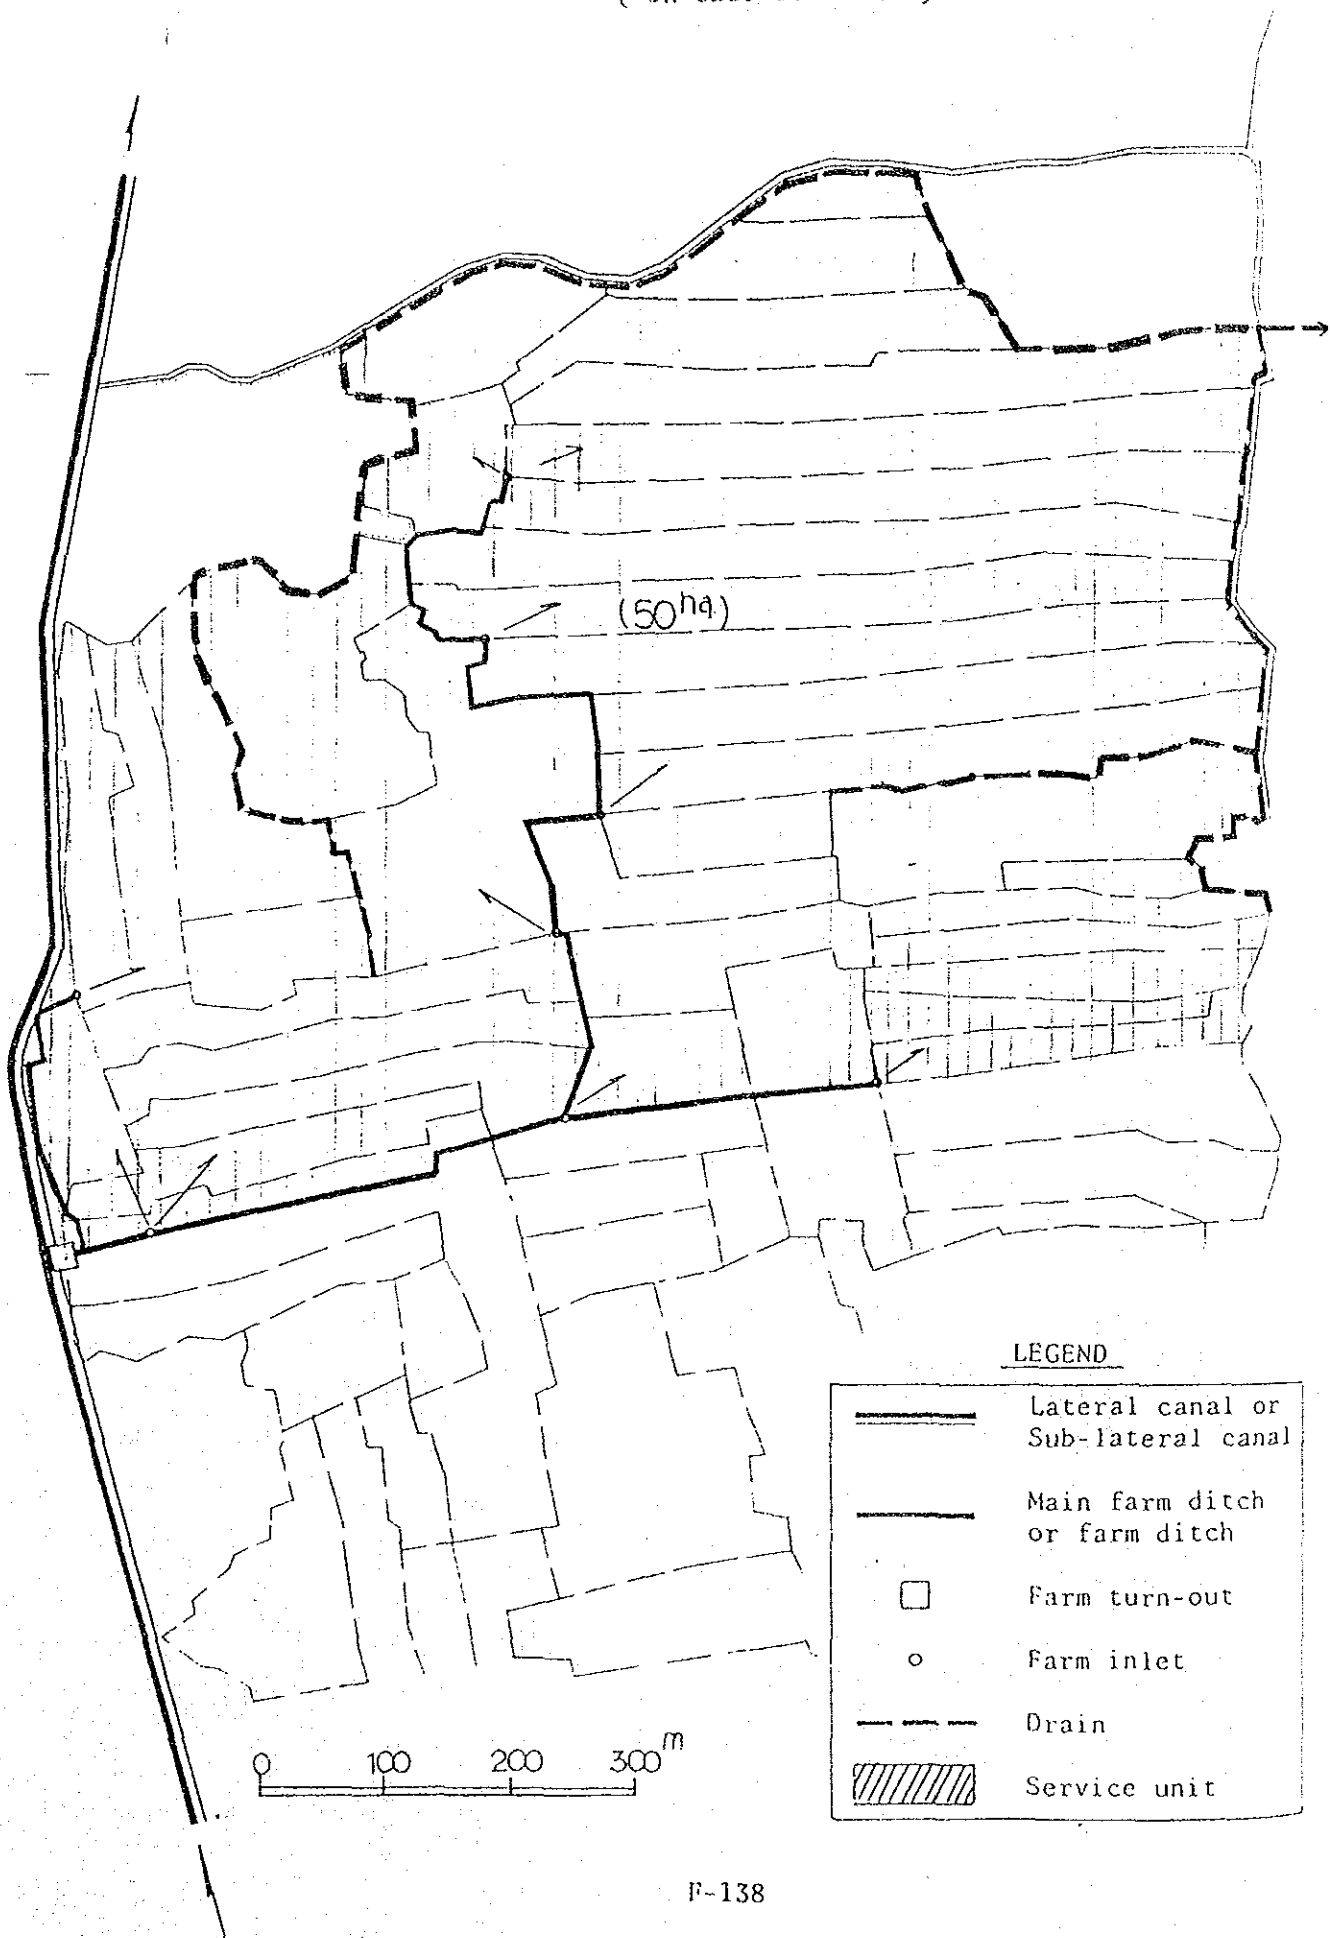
(1) Typical Layout of On-farm Facilities (1/2)
